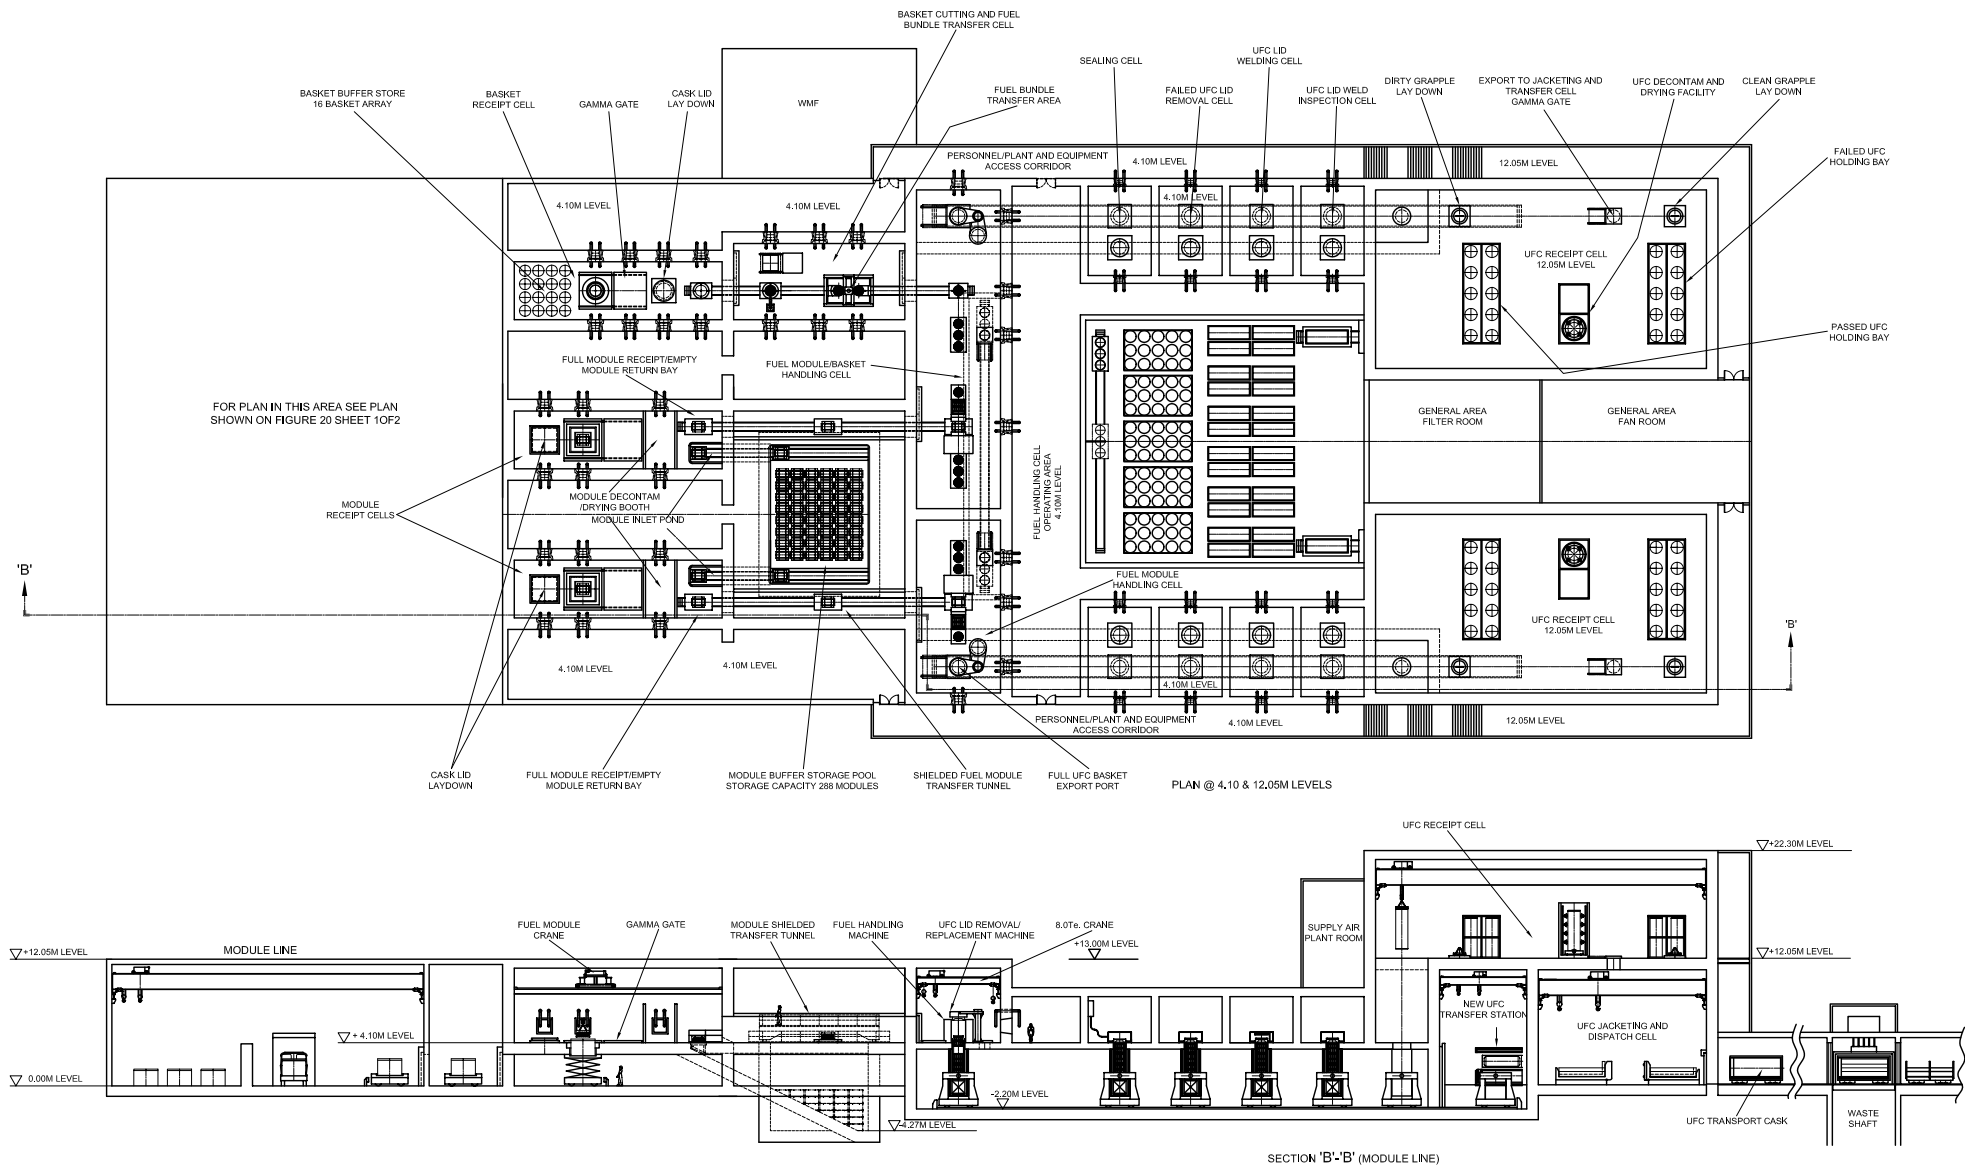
USED FUEL PACKAGING PLANT (UFPP) LAYOUT SHEET 2 OF 2
